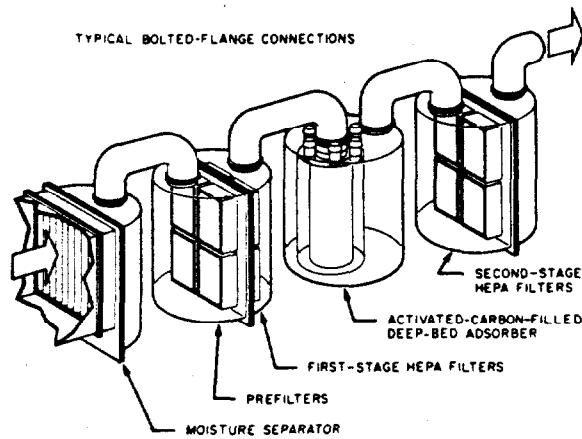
Fish remotely maintainable tub system. Courtesy J. F. Fish, American Air Filter Co.
